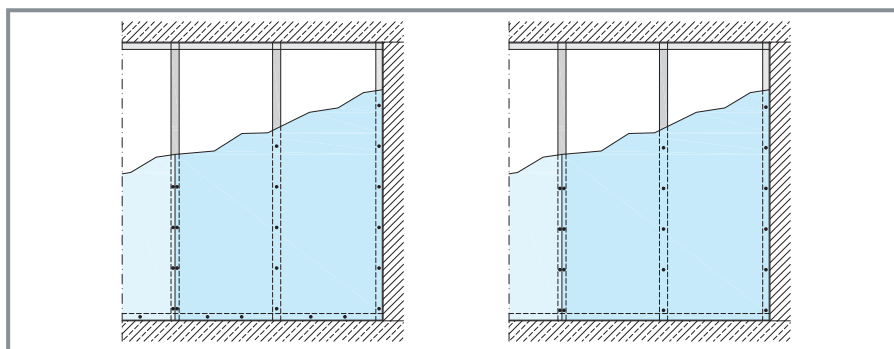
Fastening of cladding with and without screw attaching into the floor connection profiles
